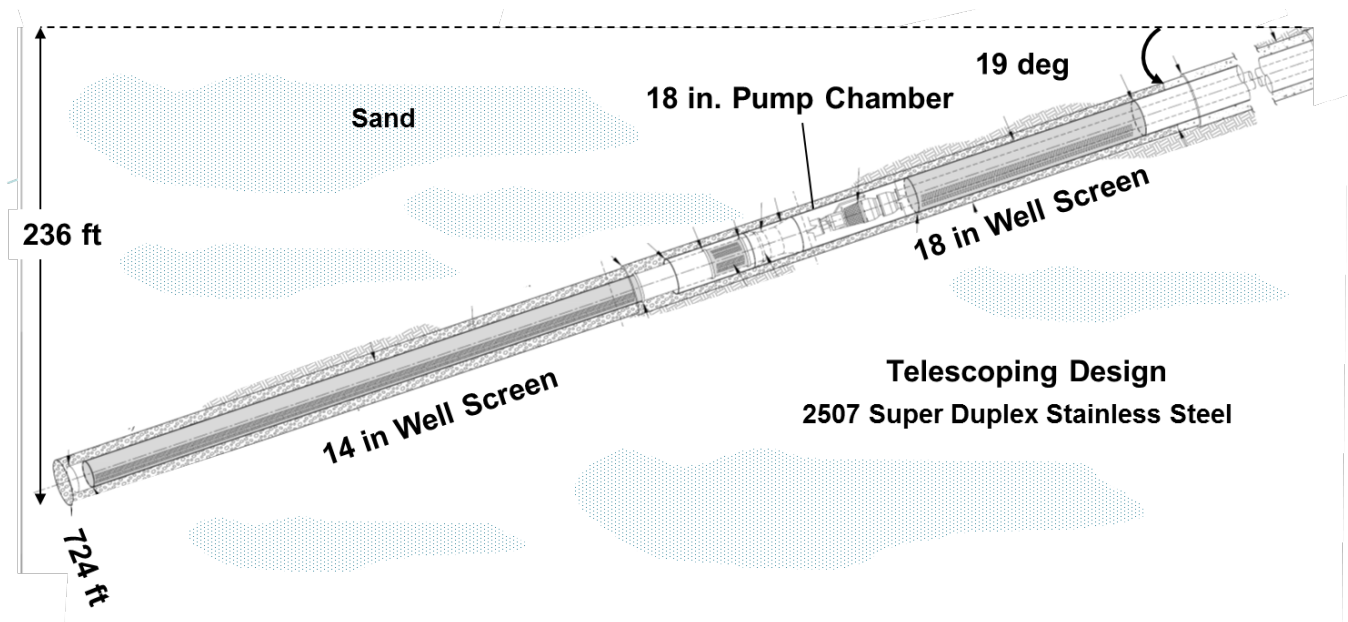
Telescoping design showing larger pump house casing used in the Monterey test slant well
